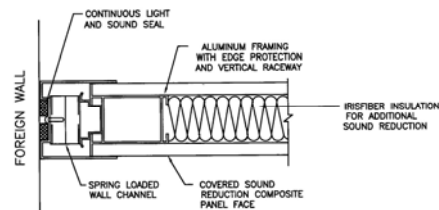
IrisWall to Foreign Wall Connection, EWS
